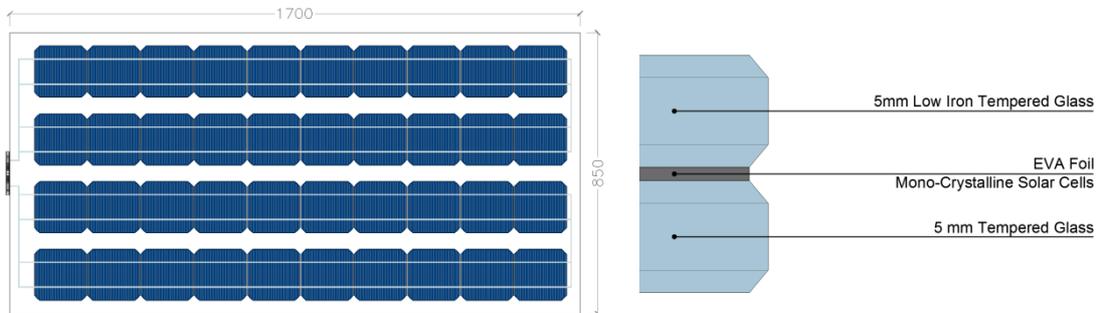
PV glass designed for the Parking Lot: plant and section. Source: Onyx Solar
